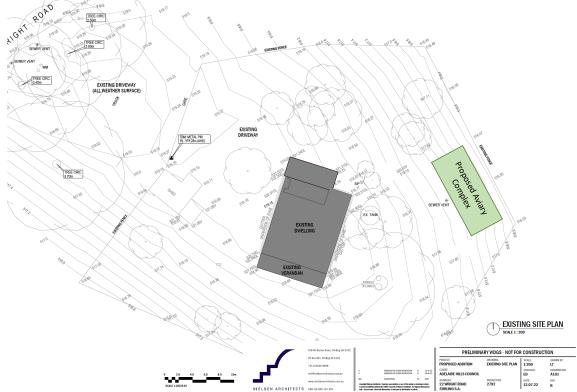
Site Plan with proposed location of Wildlife Finishing School
